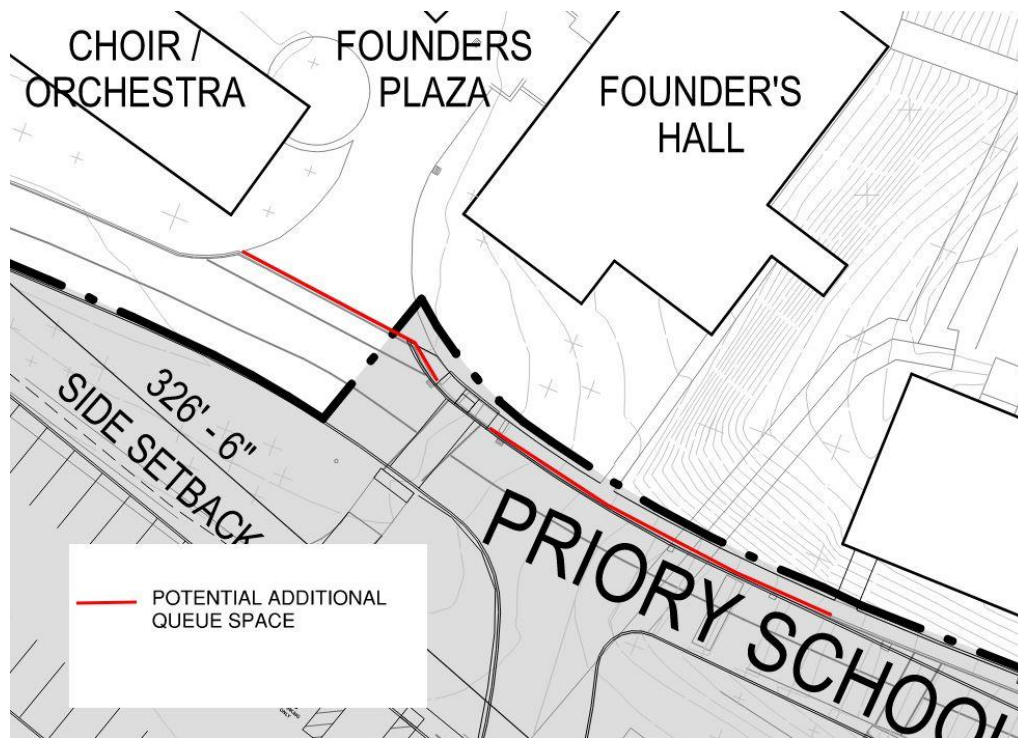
Alternative Drop-Off and Pick-Up Curb and Queue Space
